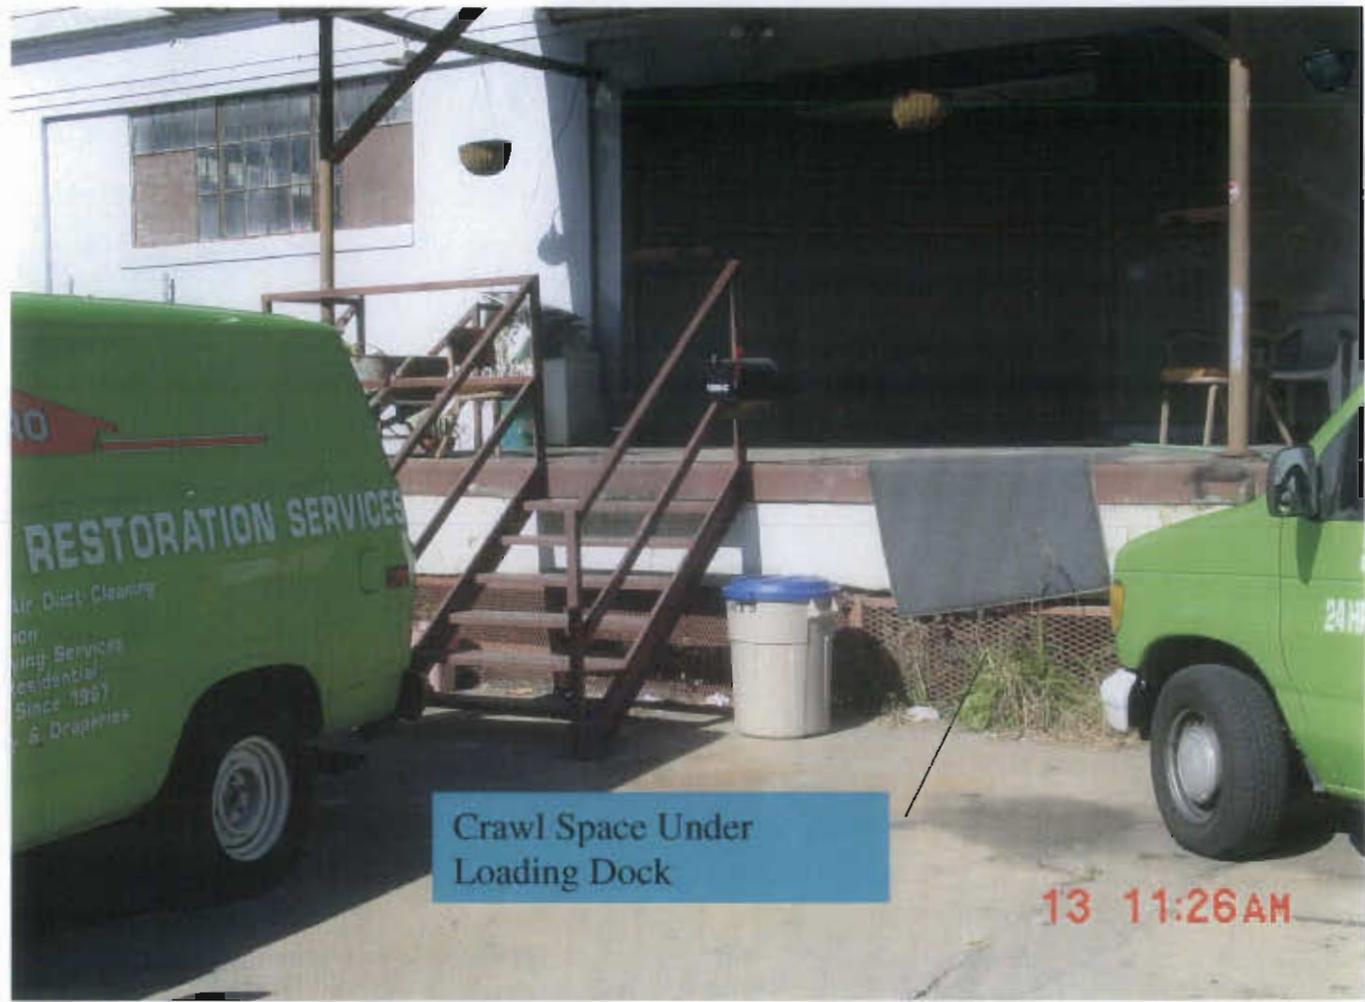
View of Loading Dock at Building 35 with Crawl Space Under Loading Dock
